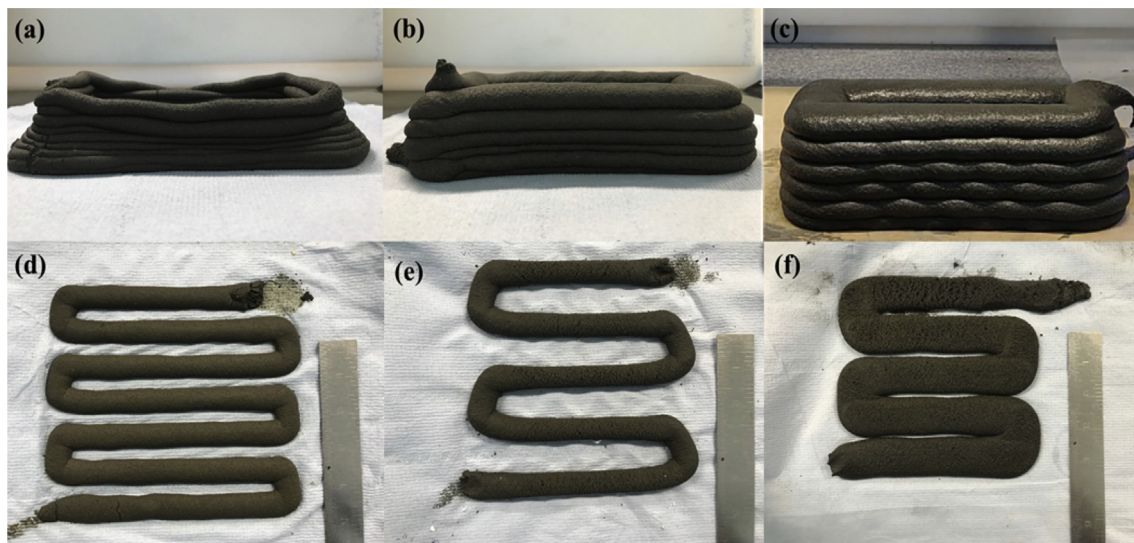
Printed samples using various nozzle diameters (a,d) using a 10mm nozzle (b,e) 15 mm nozzle and (c,f) 20 mm nozzle.
